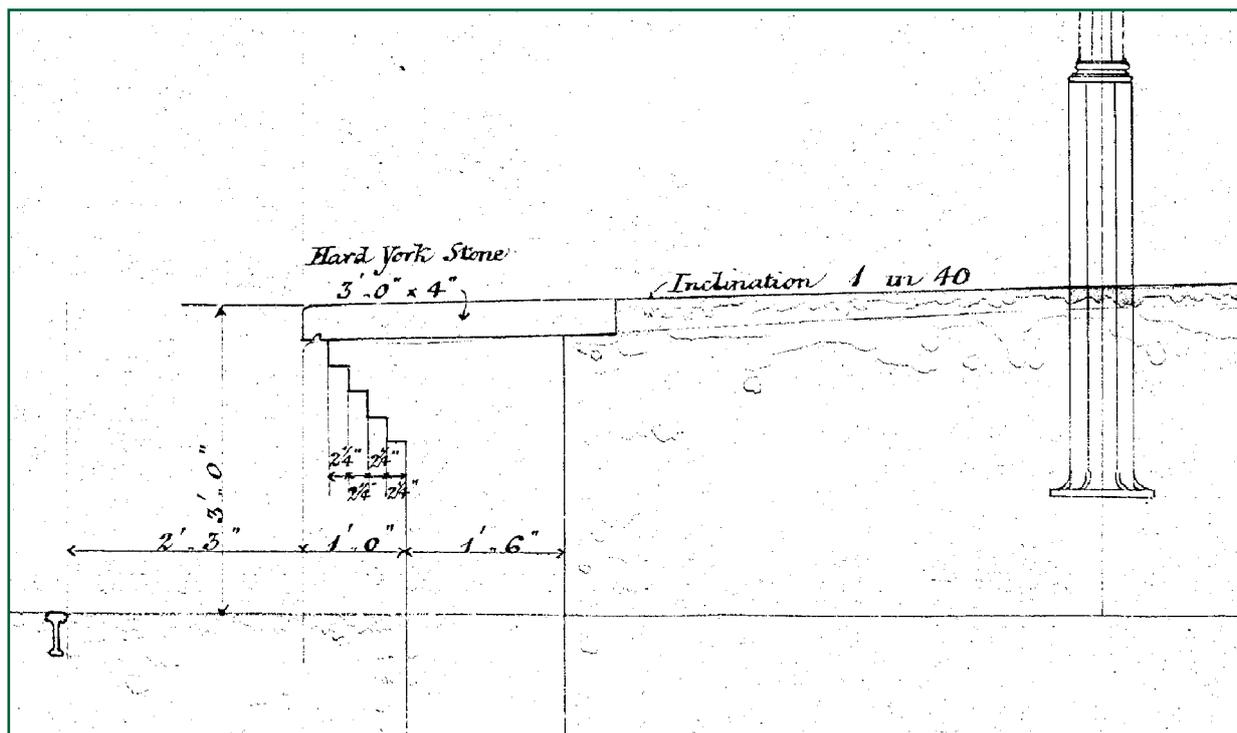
Southend Central station – cross-section drawing from 1899 showing 1 in 40 slope on the platform, falling towards the railway
